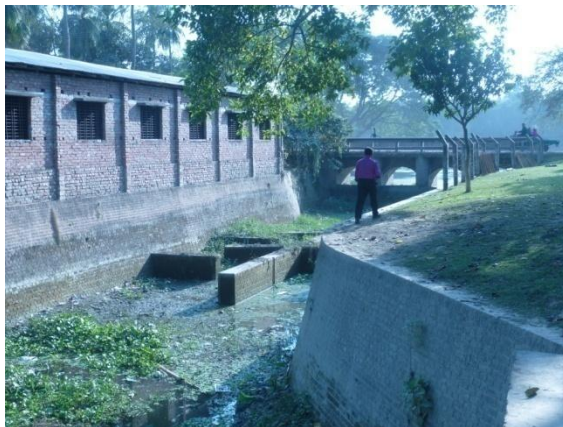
The Railway and Road Bridge running parallel over the Kobadak at Jhikargacha.
